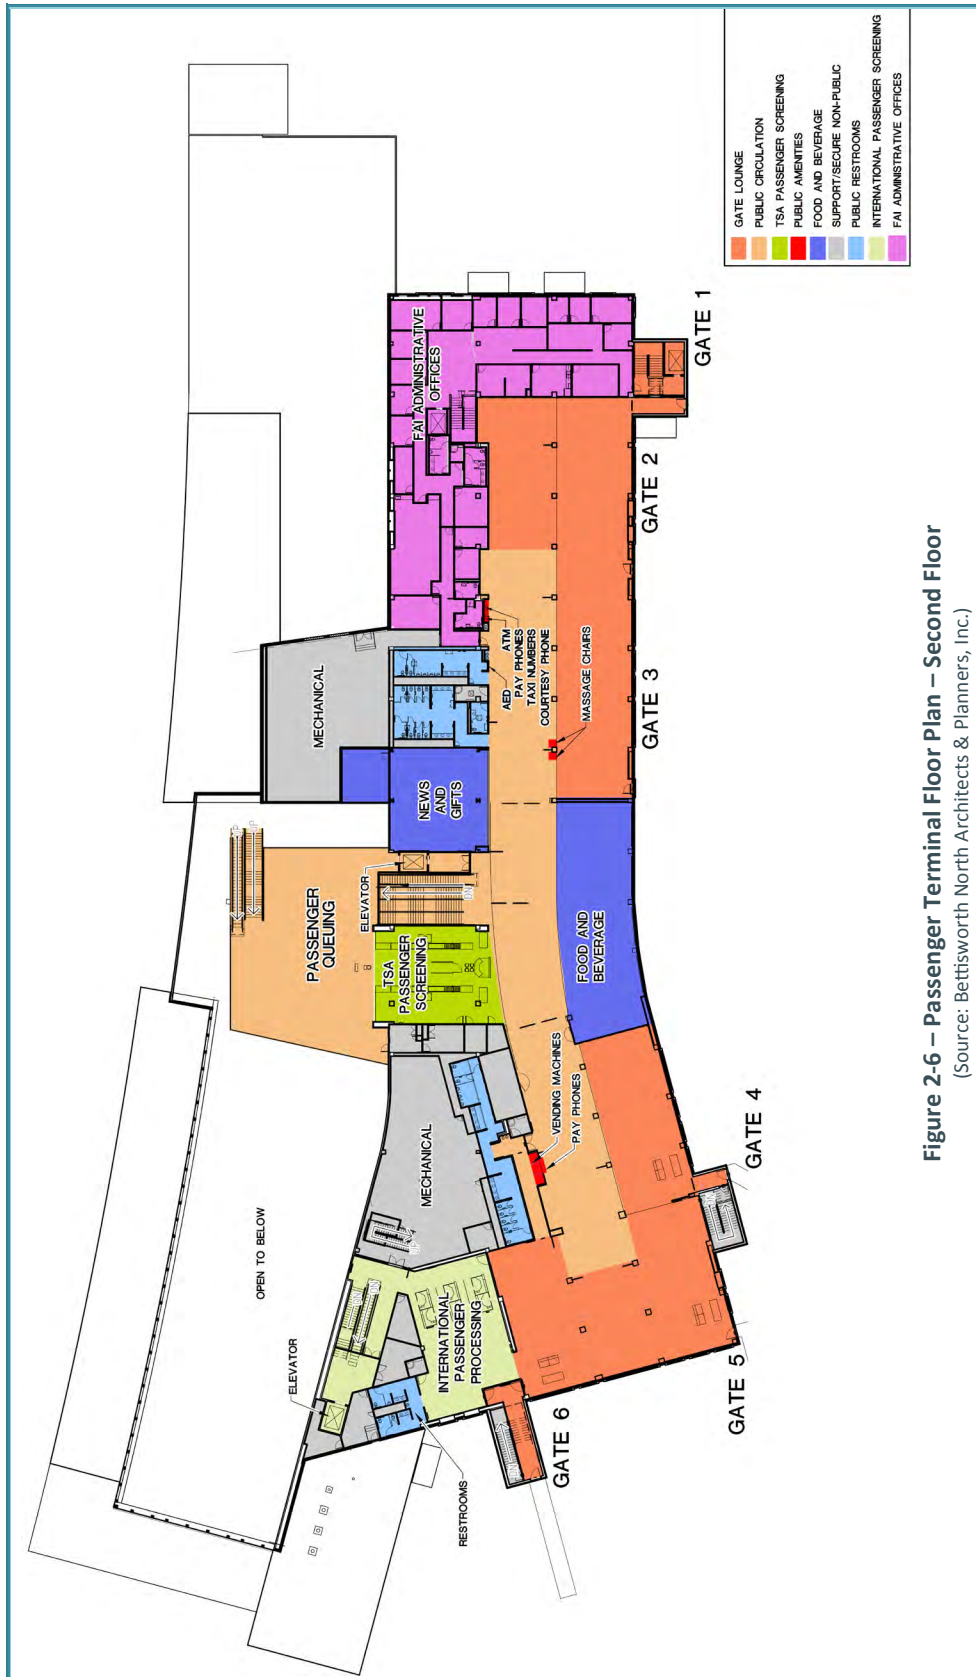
Passenger Terminal Floor Plan – Second Floor
